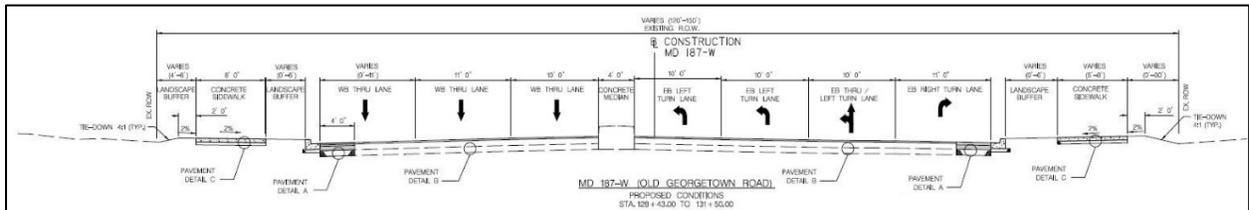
Proposed Phase 2 Cross Section – Old Georgetown Road (MD 187) just west of Rockville Pike (Looking East)
